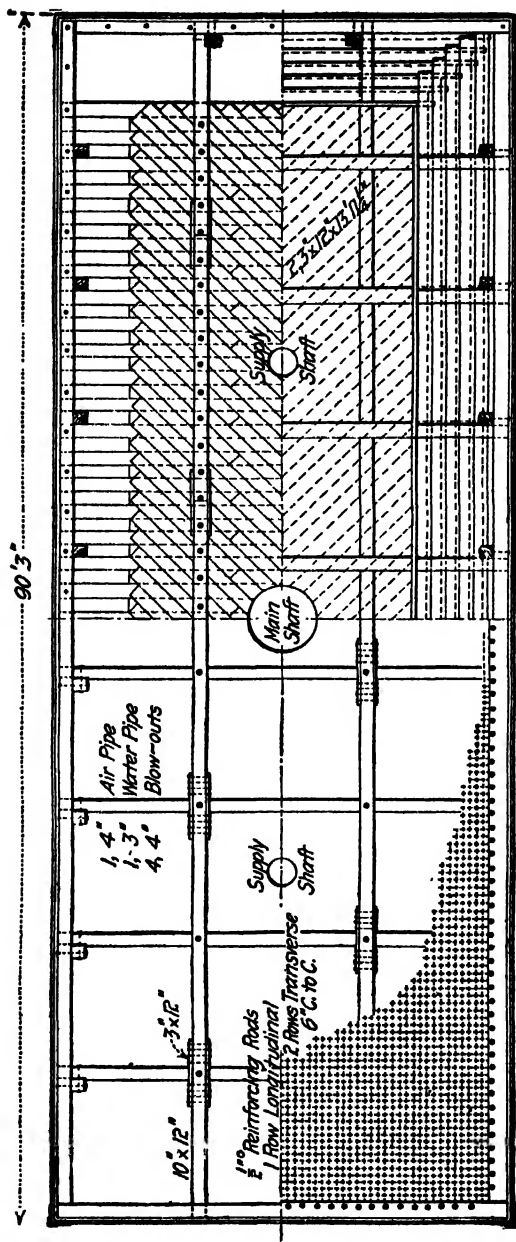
Plan of Steel Cutting Edge, Broadway Bridge.
